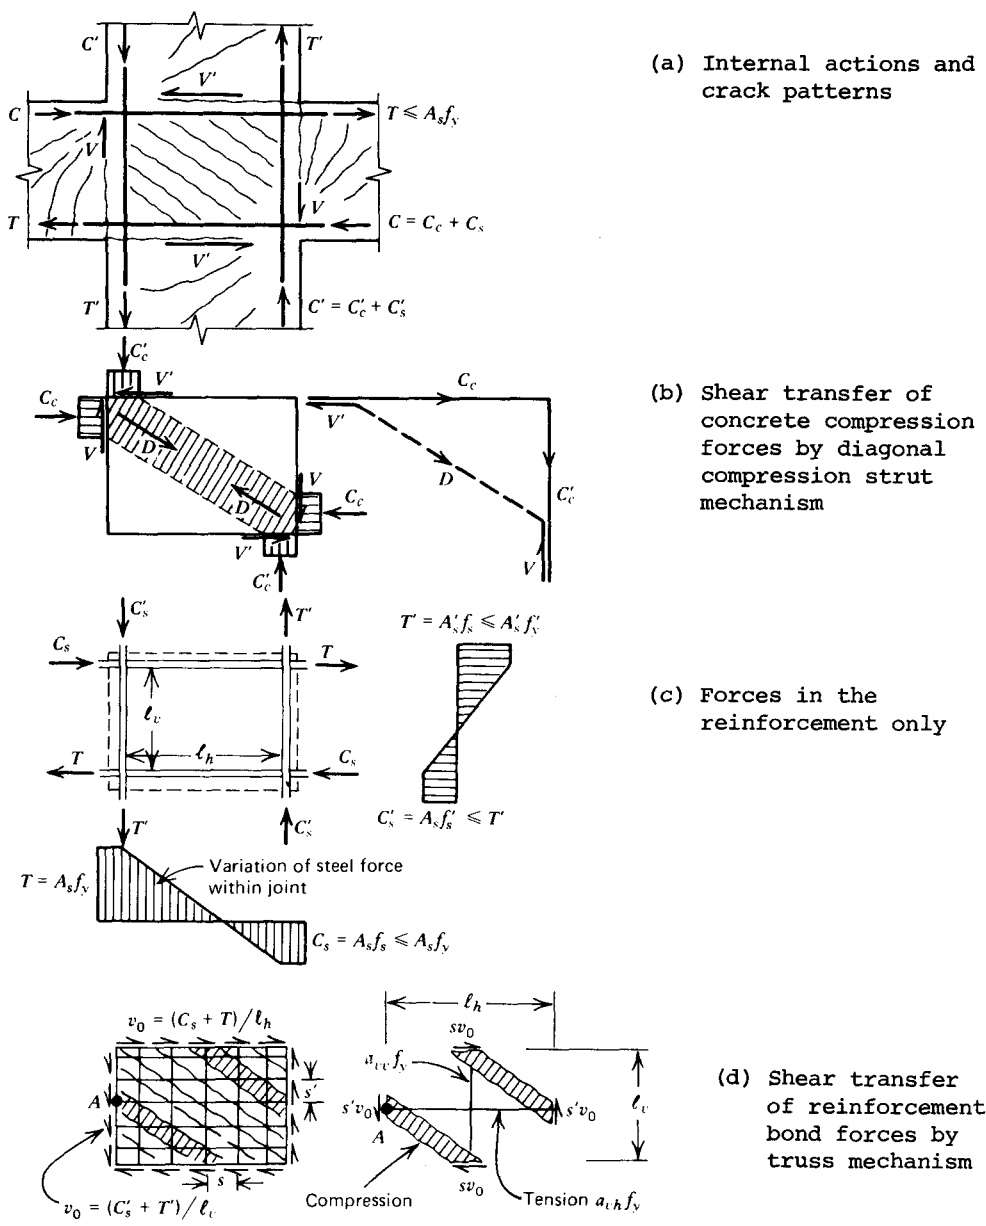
Idealised Behaviour of Reinforced Concrete Beam-Column Joint of Frame Subjected to Horizontal Loading [3].
